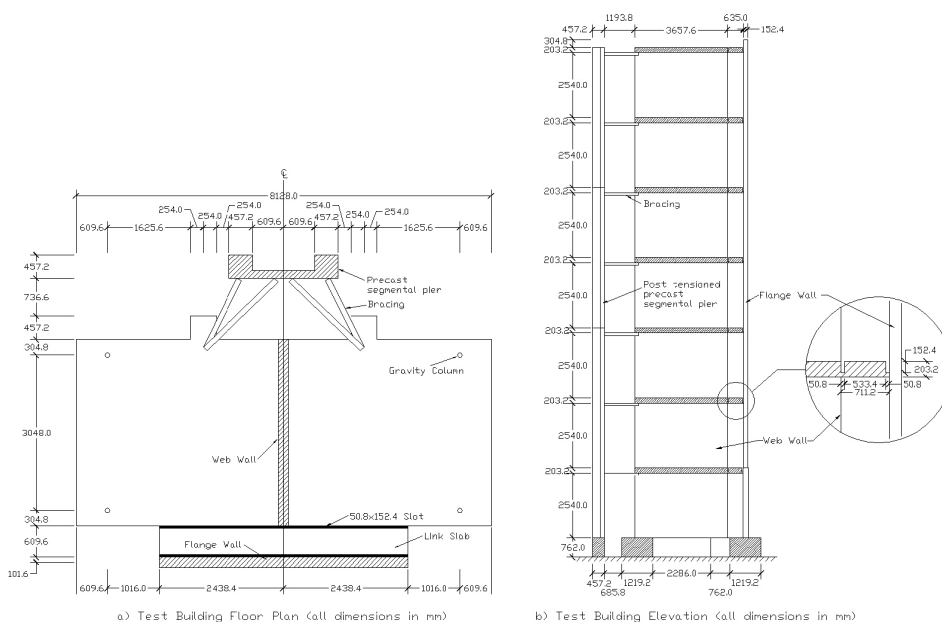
Floor plan and elevation of the test building [after NEES7Story, 2006].
